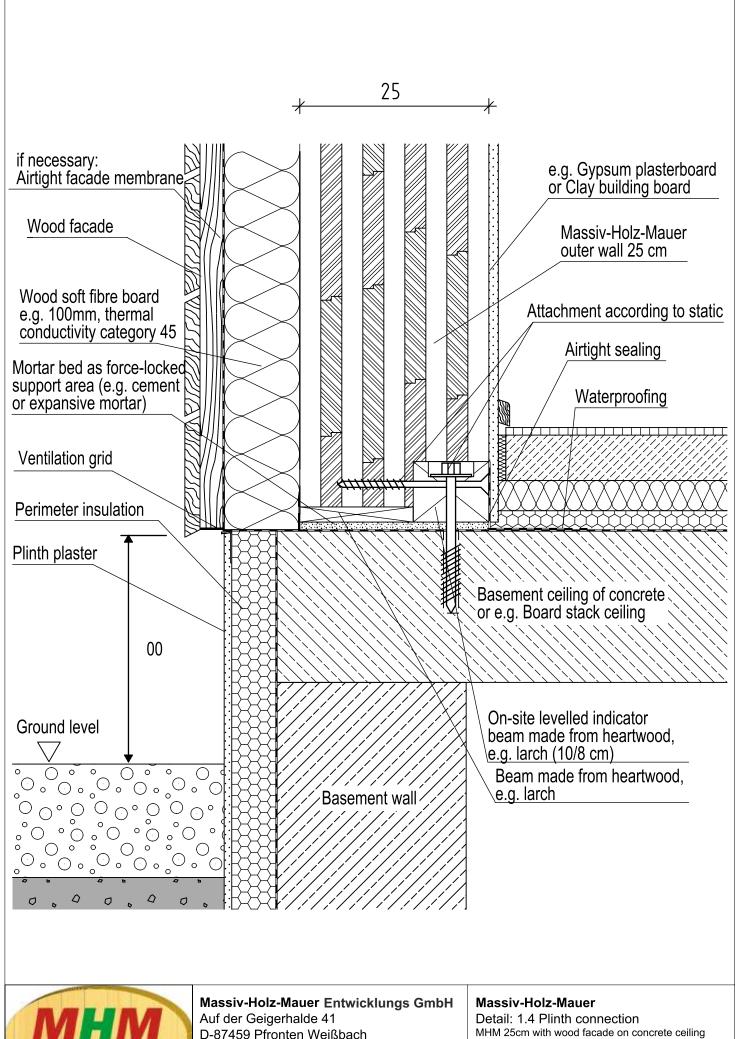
Plinth connection MHM 25cm with wood facade on concrete ceiling
